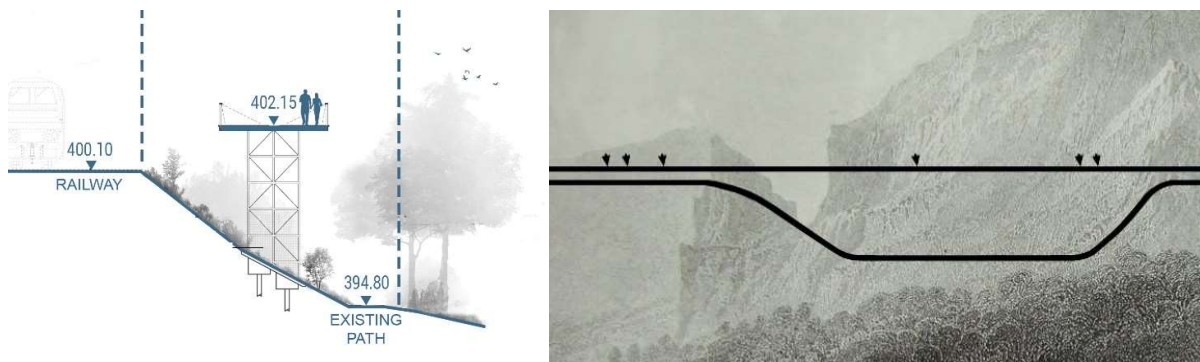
Section (left) and concept montage of the existing/ new pathways above the landscape
